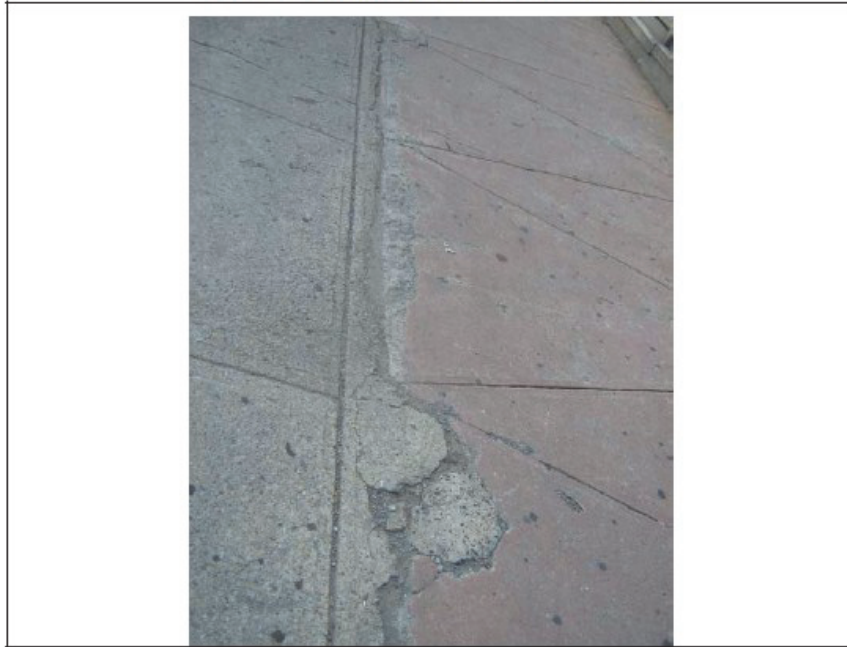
Minor cracks on concrete sidewalk located on the north elevation.
